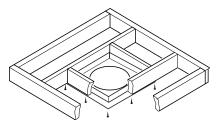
Firestop Spacer with Living Space Above Ceiling
